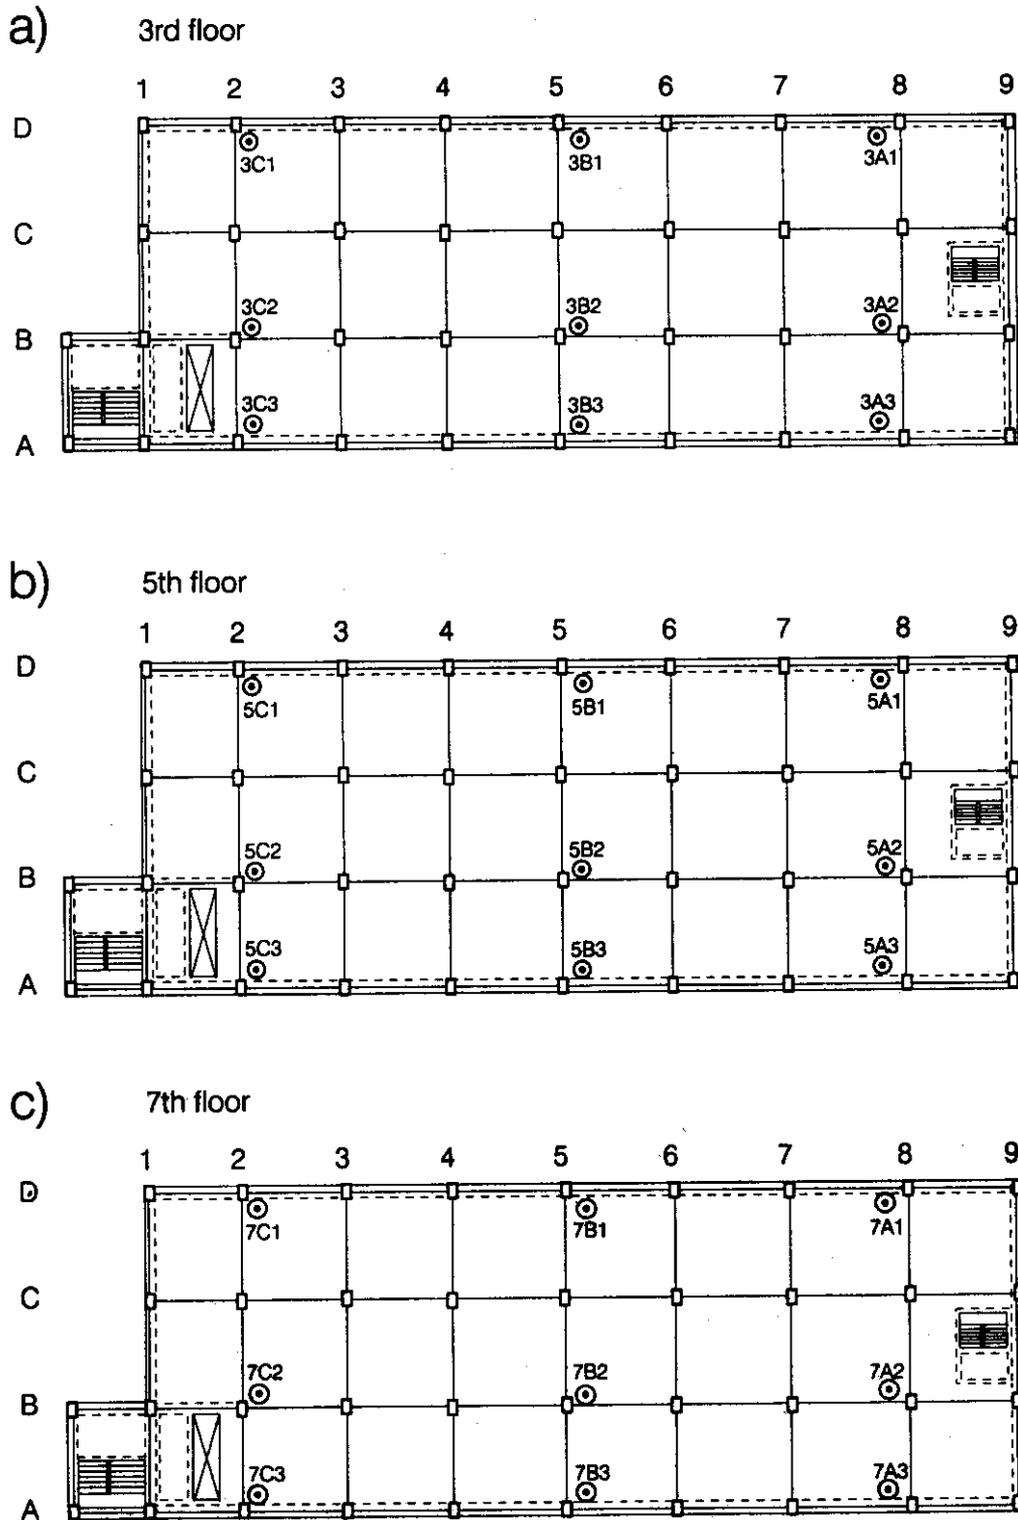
Experiment II: position of instruments on (a) 3rd, (b) 5th and (c) 7th floors
